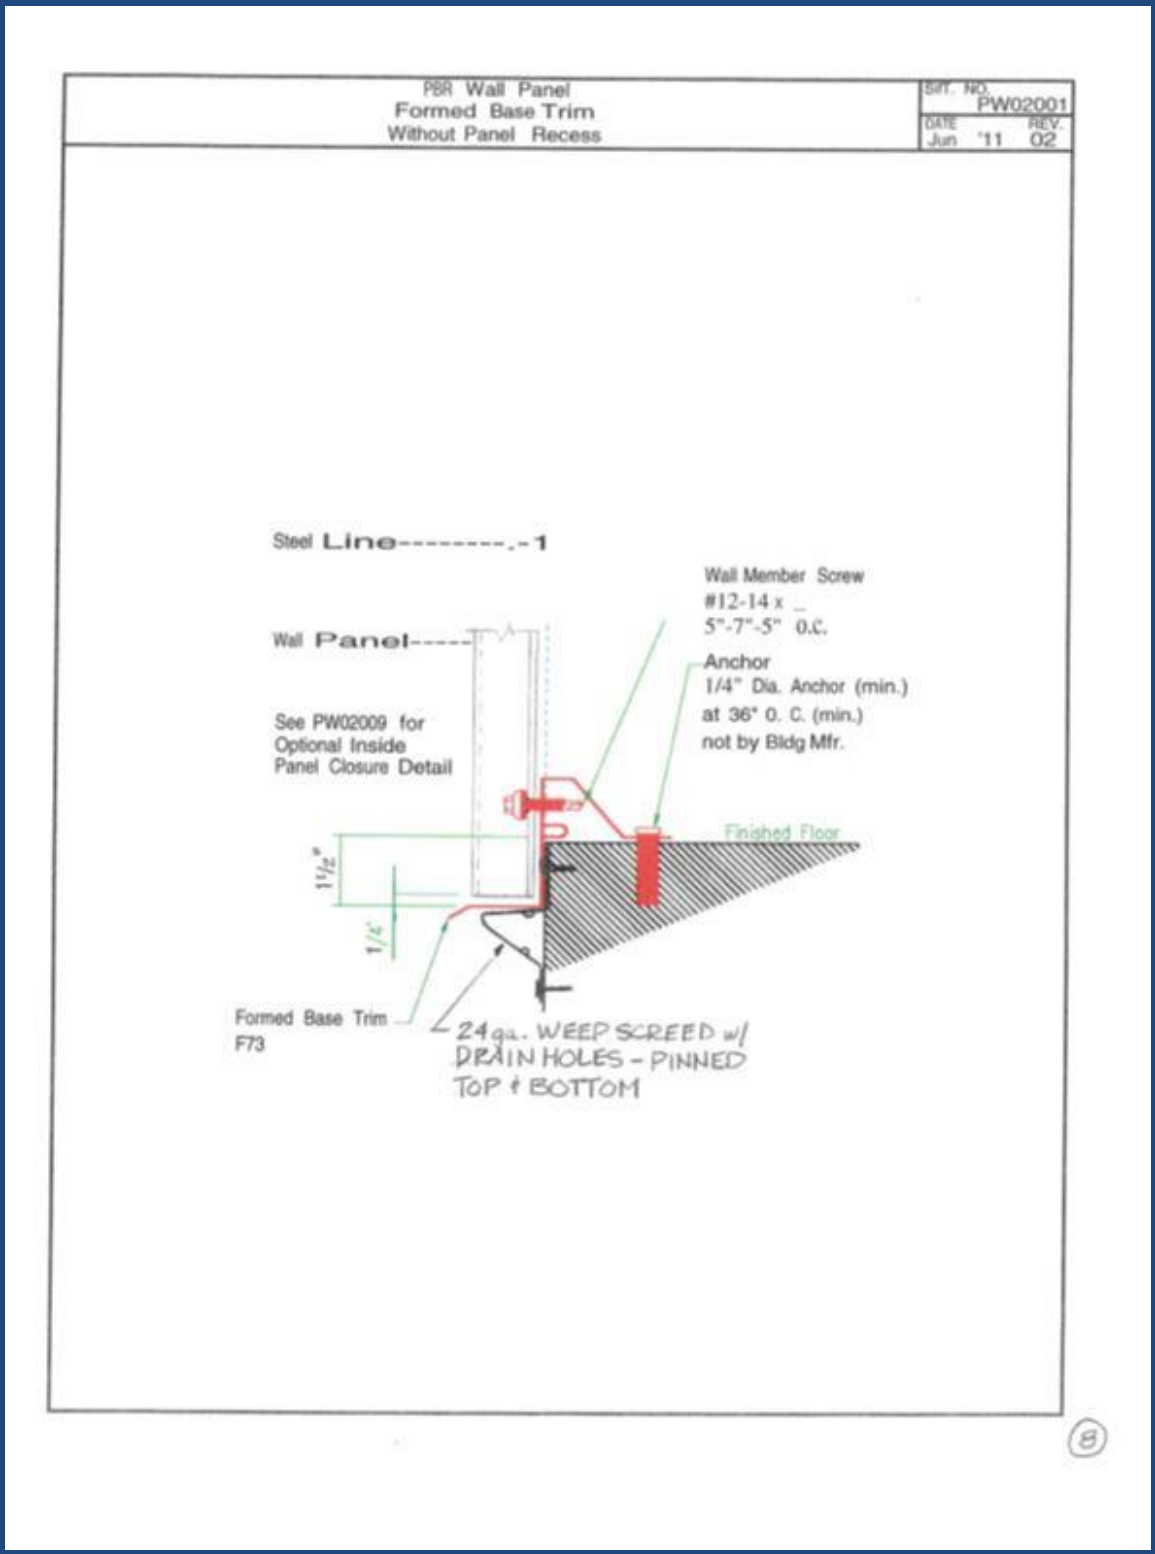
Wall Panel Formed Base Trim Sub-Flashing Detail
